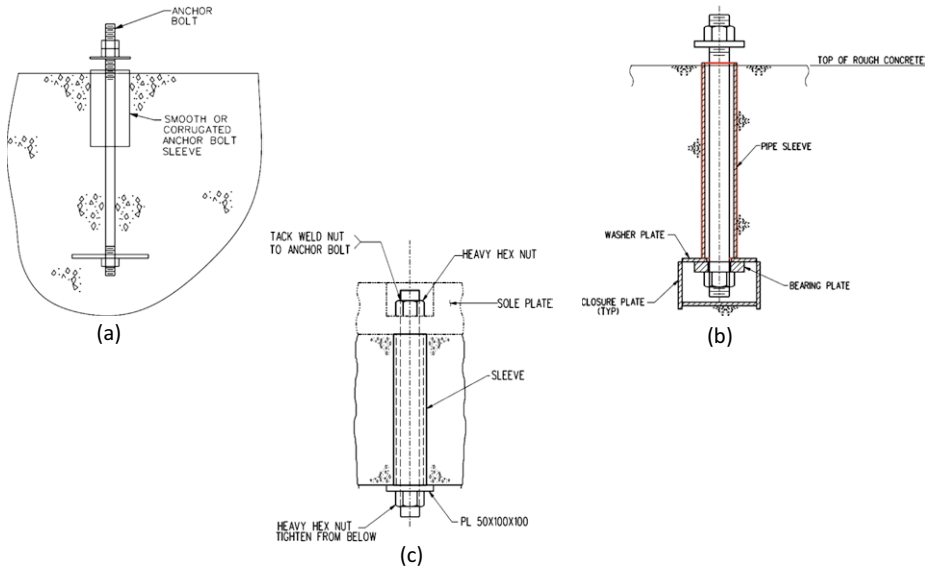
Anchor with partial sleeve (a), anchor bolt with full-length sleeve (b), and anchor bolt with full-length sleeve for through-bolt (c)
